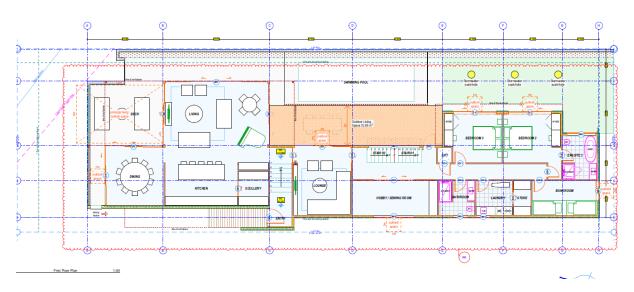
Proposed First Floor Plan (Source: Drawing Number A202, dated 3/10/2020).
